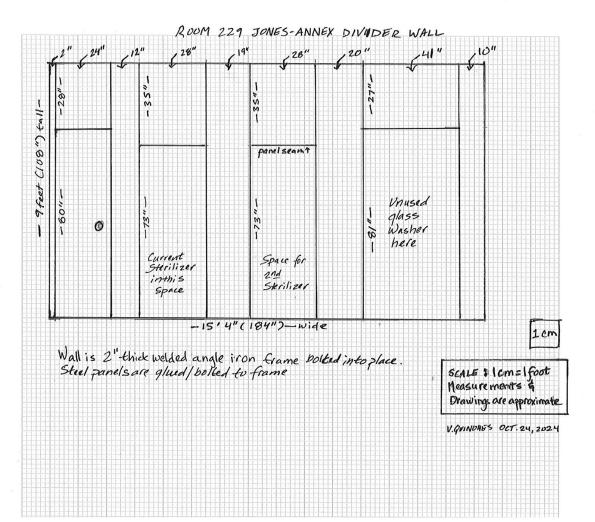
Elevation drawing of the divider wall showing the dimensions of the steel panels and the locations of openings.
